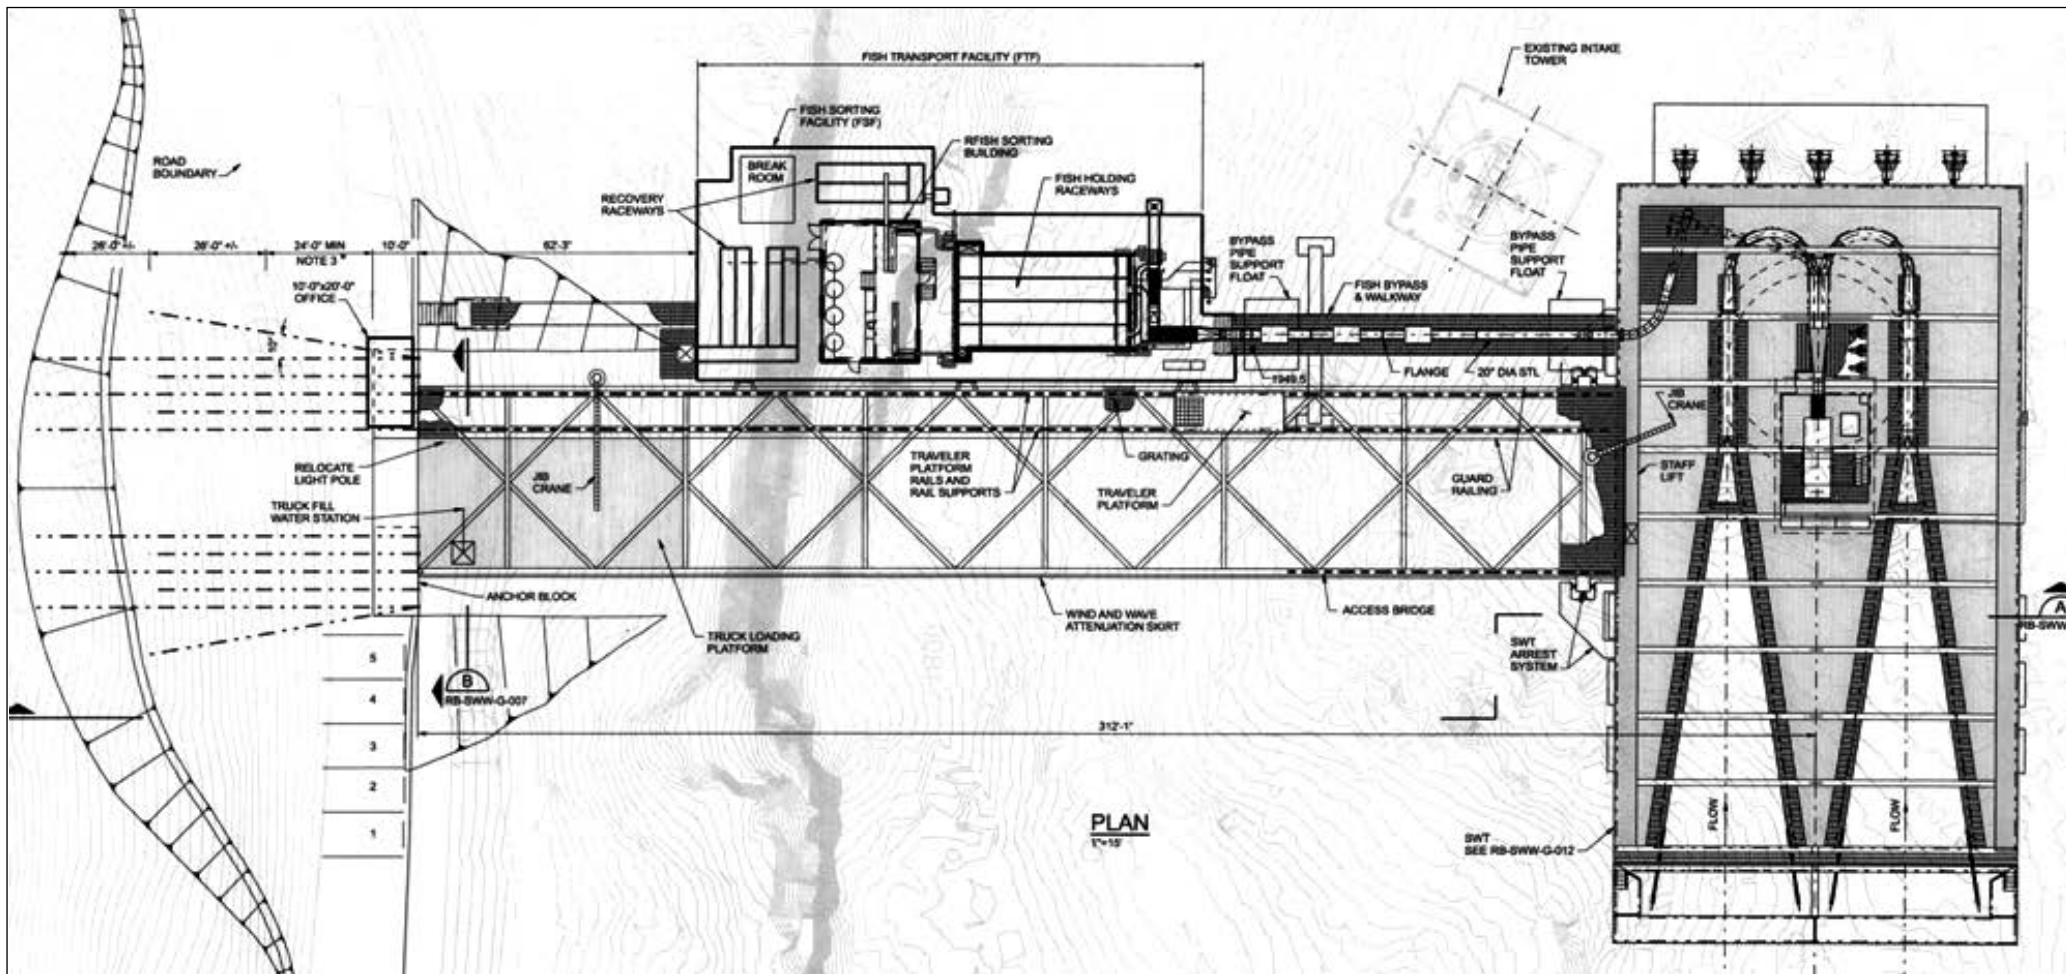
SWWT and Fish Transfer Facility Plan View Drawing (Designed by CH2MHill – Drawing courtesy of PGE)
